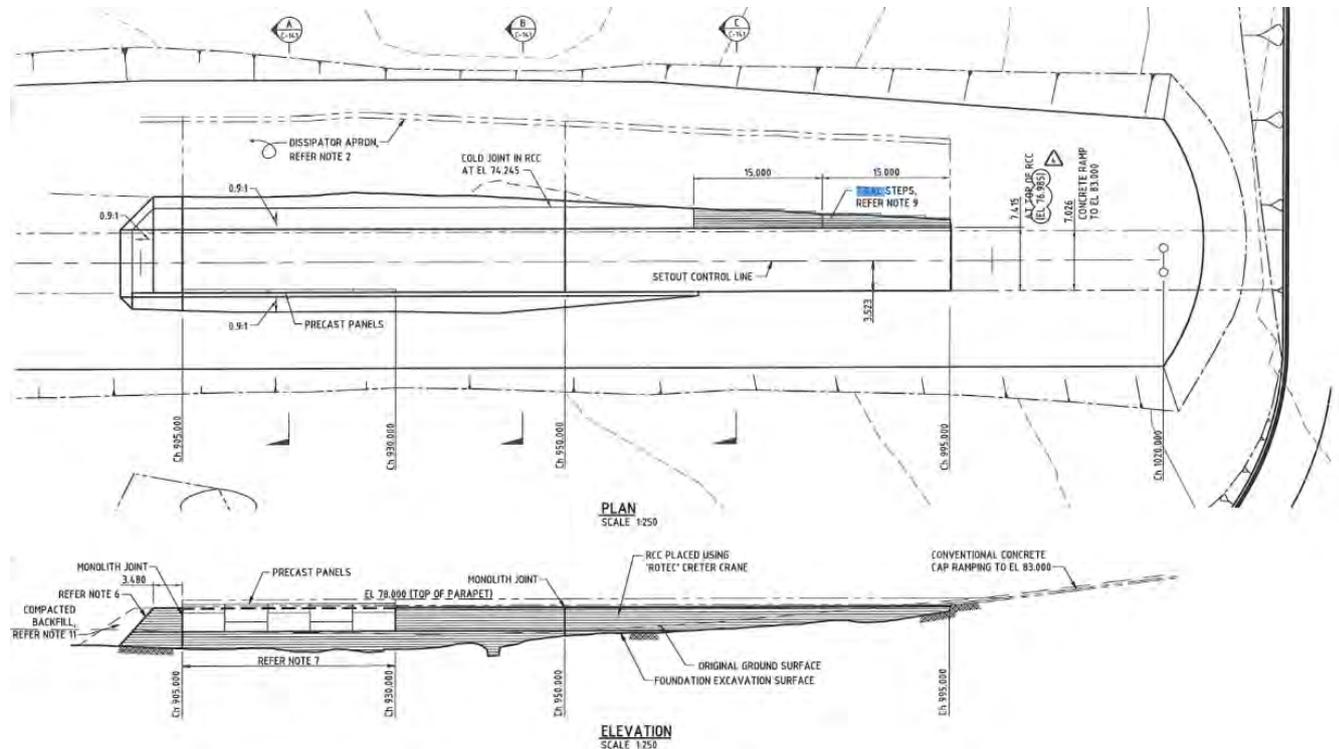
Plan and elevation of trial embankment<sup>368</sup>
